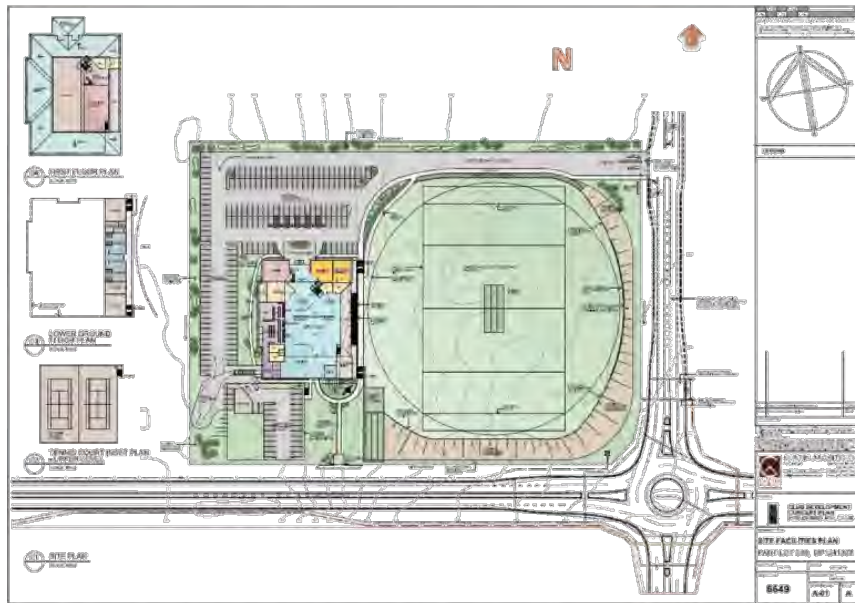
Proposed Development Site Plan (Curtin Architect September 2020)
